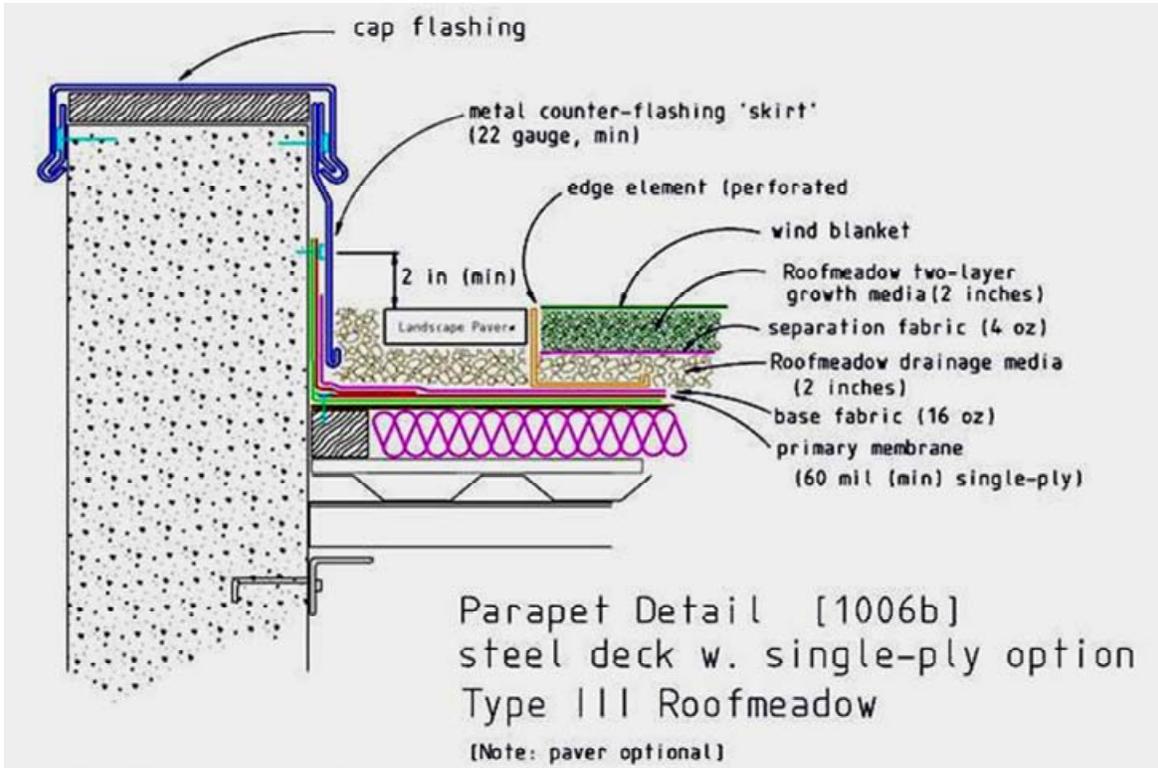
Typical green roof edge detail (Source: Roofscapes, Inc)
